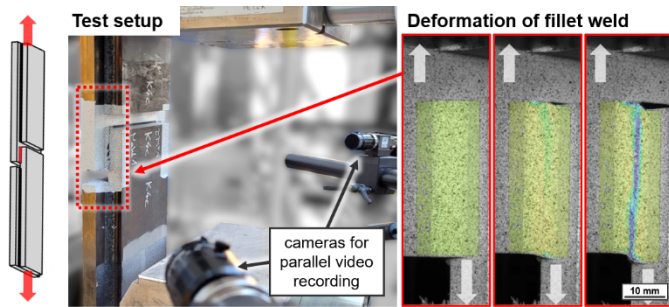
Experimental setup for tensile tests of longitudinal fillet welds with optical local extension measuring
